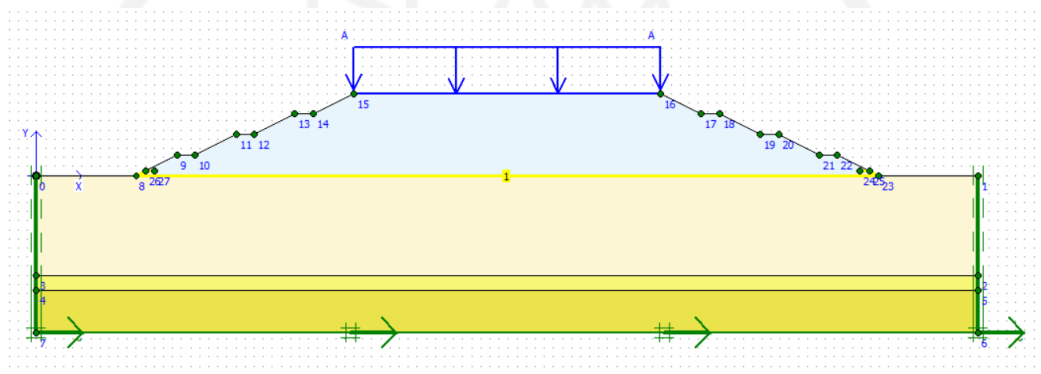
Modelling of Embankment 3 Trap with Geotextile Reinforcement
